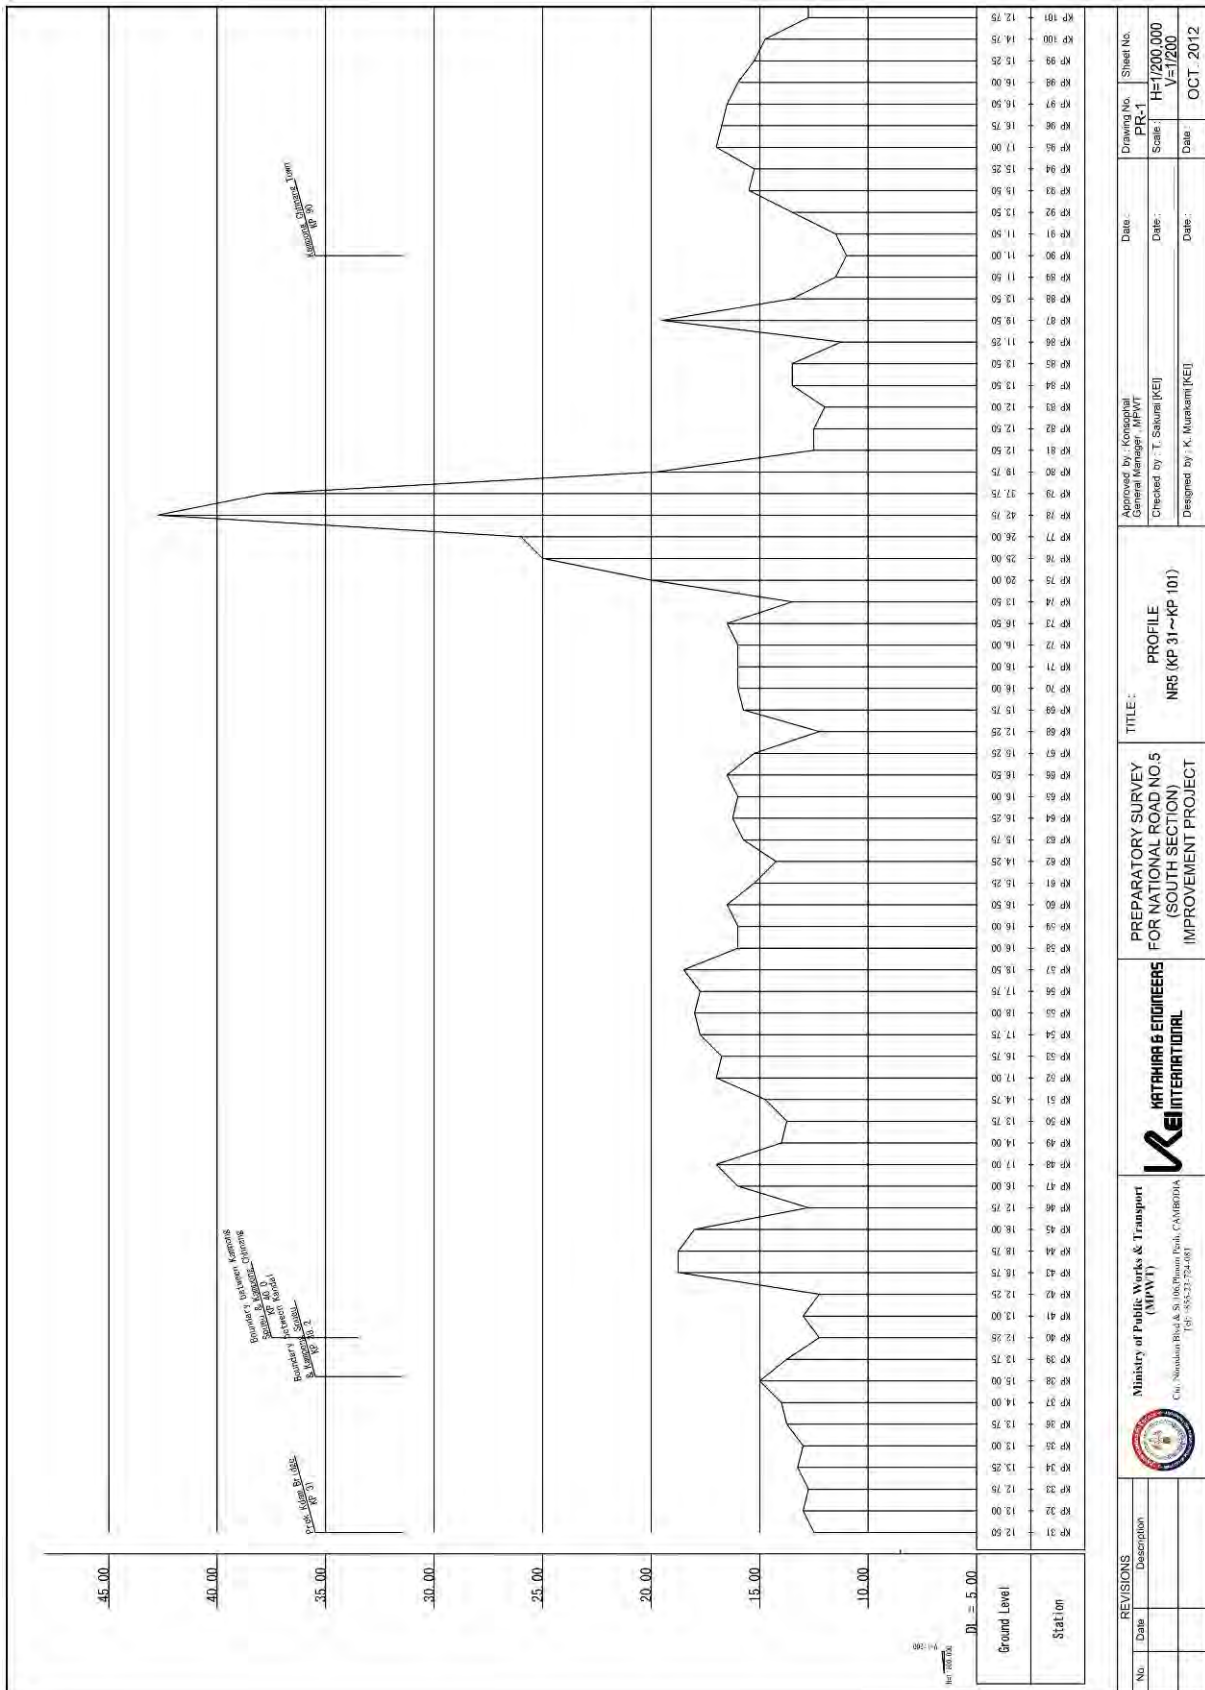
Estimated Road Elevation KP 31 to KP 101
